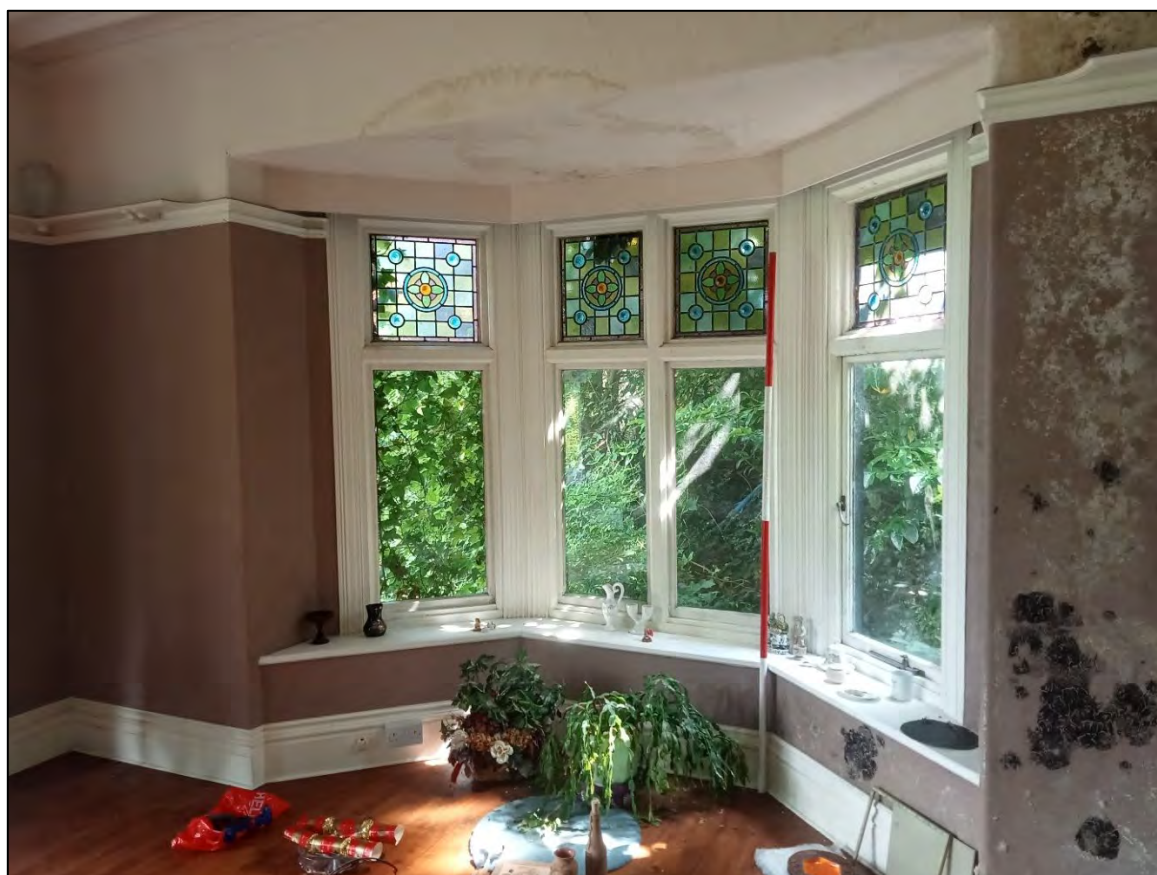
Angled bay window to east wall of Room 6, looking north-east. Scale 2m.
